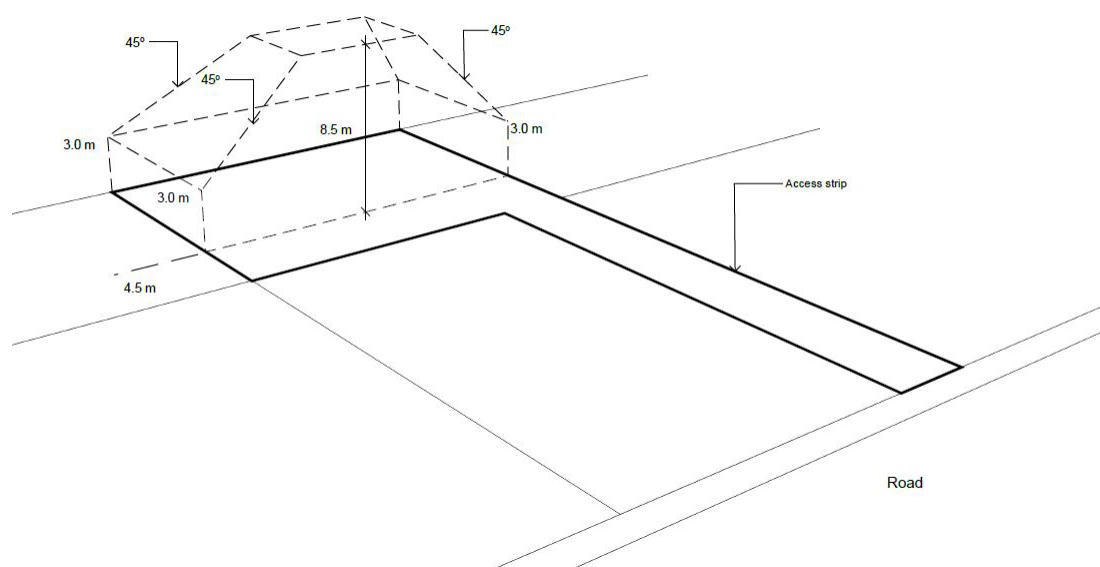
Building envelope for internal lots as required by clause 10.4.2 A3(a)
